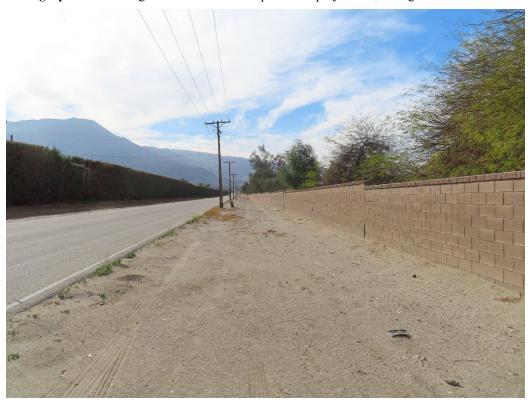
Standing at the center of the northeast spur of the project site, facing south.
